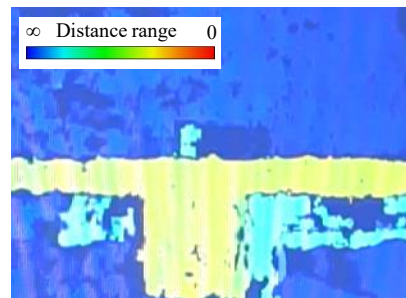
Inspection of defective parts of tile specimens by drone-mounted infrared camera.
